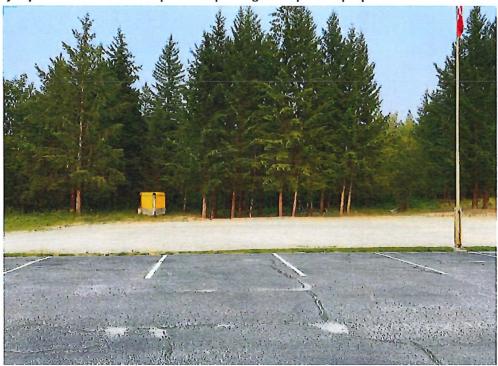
Existing Playfield and Church Garden (Shed in background). Facing East - photo taken near the property line. Photo shows that natural grade can be maintained with minimal cut/fill required to extend playfield as proposed.
